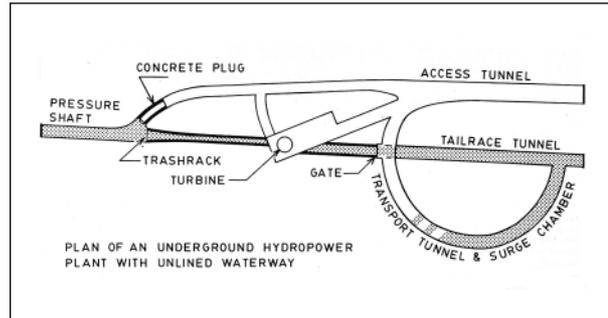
Plan of an underground hydropower plant (Broch 1985) Lake tap
